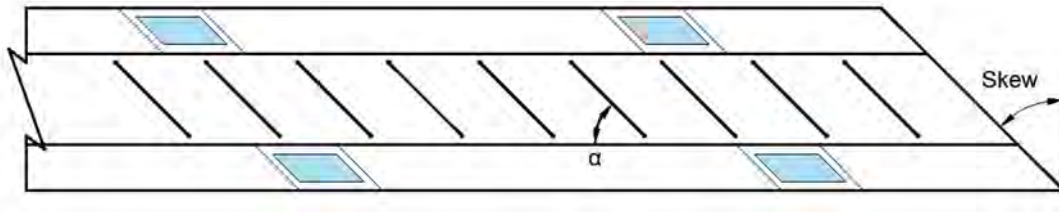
Plan View of 45 Degrees Skewed ITBC
